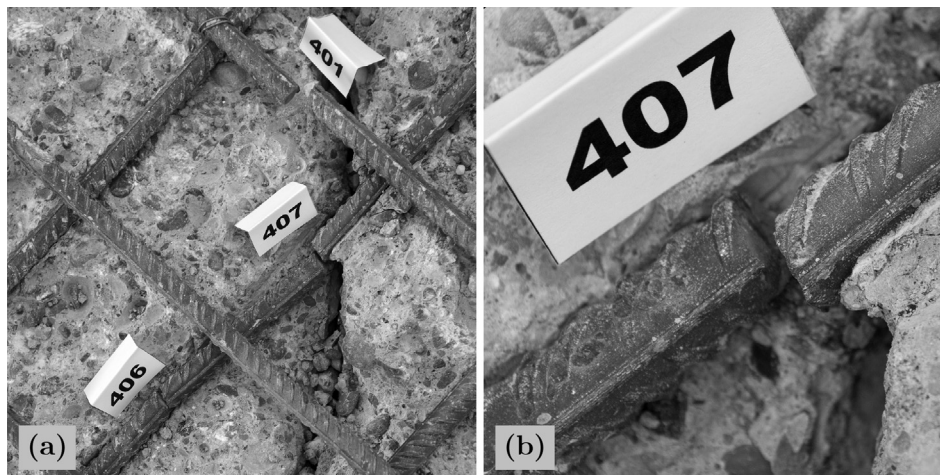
Exposed bar fractures in test B2: (a) overview at critical cross-section; (b) detail of fracture No. 407 across the critical crack.
